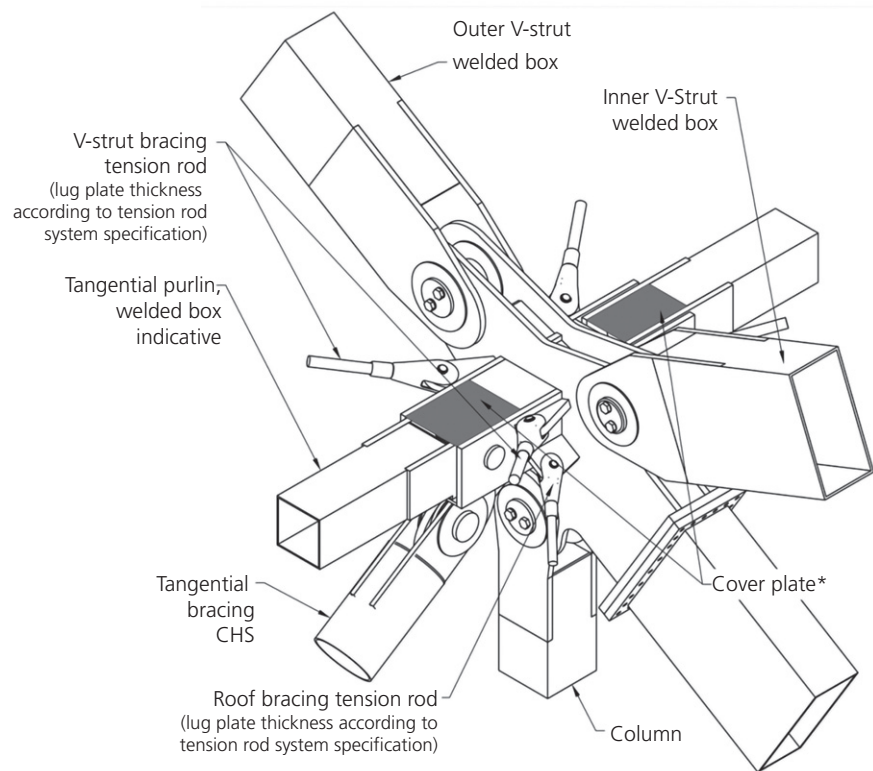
Modular detail of outermost columns supporting roof and raker beams (CHS, circular hollow section)
